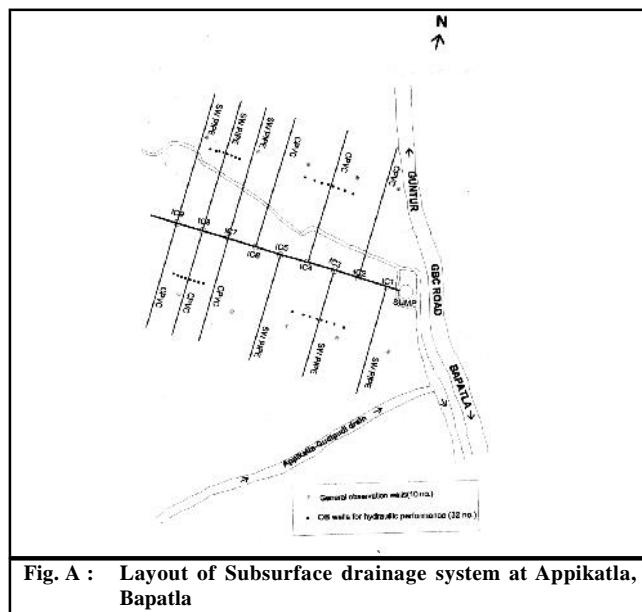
Fig. A : Layout of Subsurface drainage system at Appikatla, Bapatla
